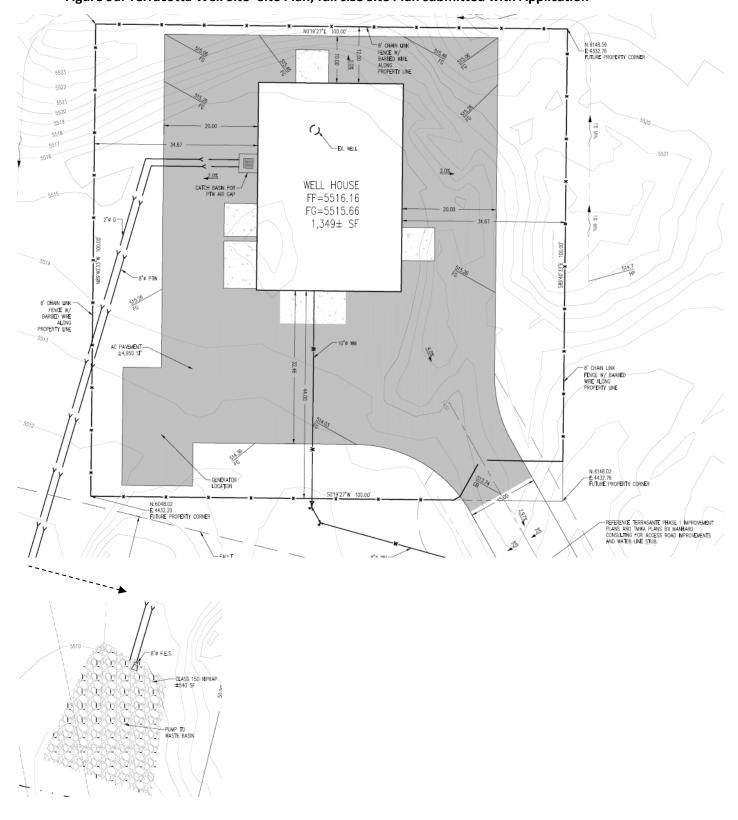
Terracotta Well Site- Site Plan; full size Site Plan submitted with Application
